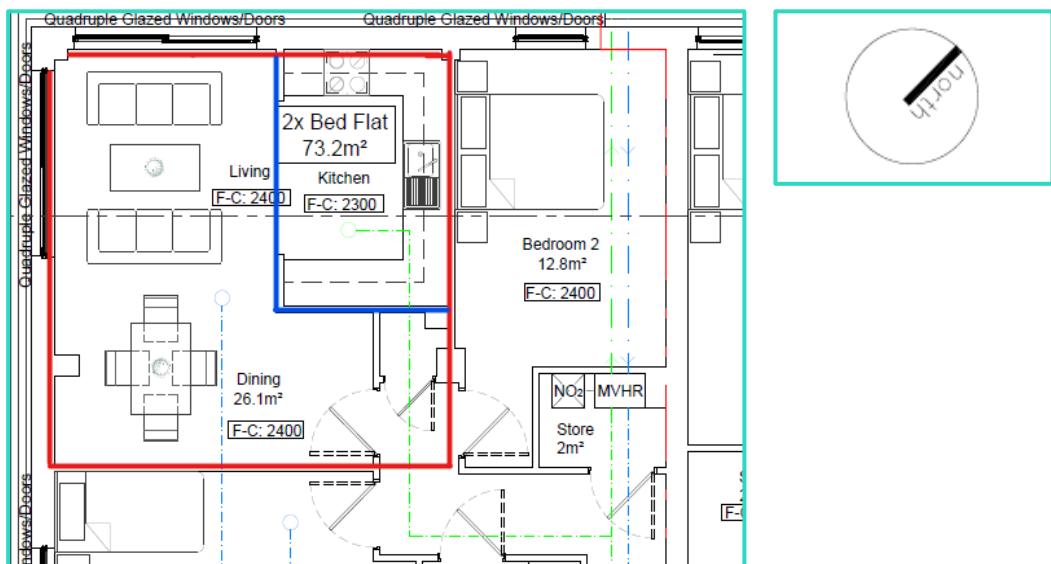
1-3 Bakers Road – Typical LKD with outlook over development site (outlined red) and kitchen position (outlined blue)
